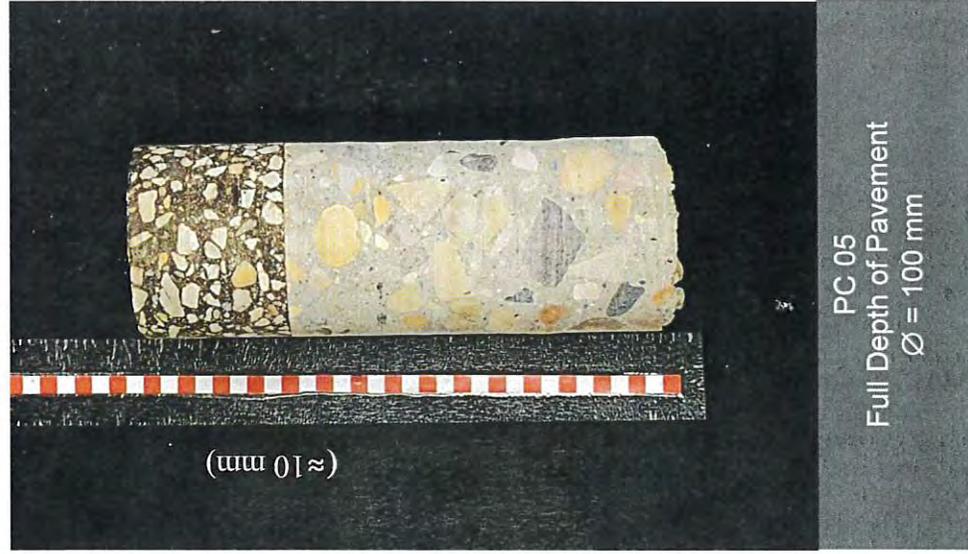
Specimen from Leila Avenue, Westbound Curb Lane
